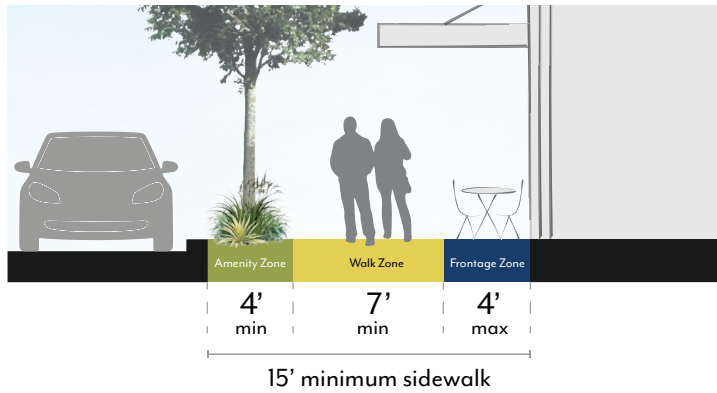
Sidewalks - Colorado Boulevard (College District)
